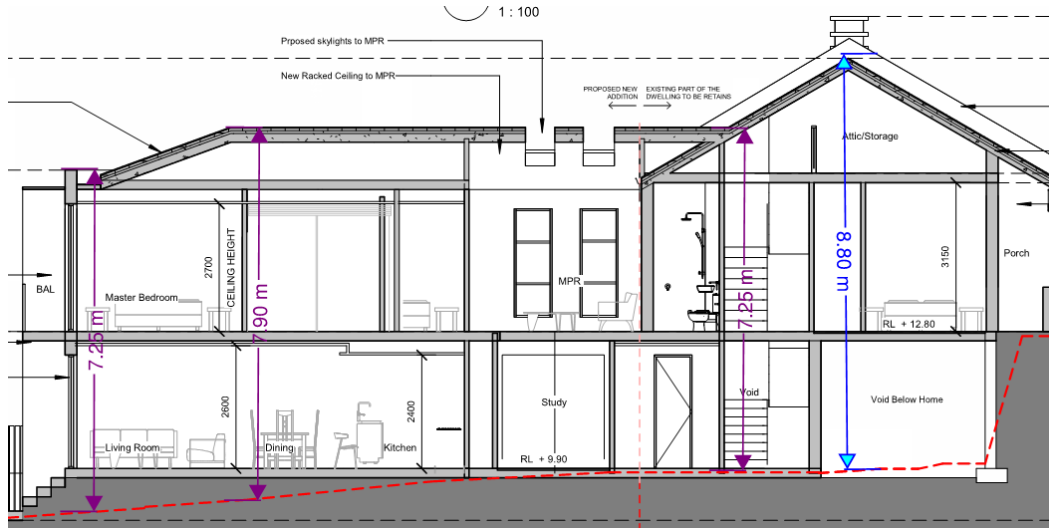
Extract of the architectural plans showing the maximum proposed building height breaches at a determined section
